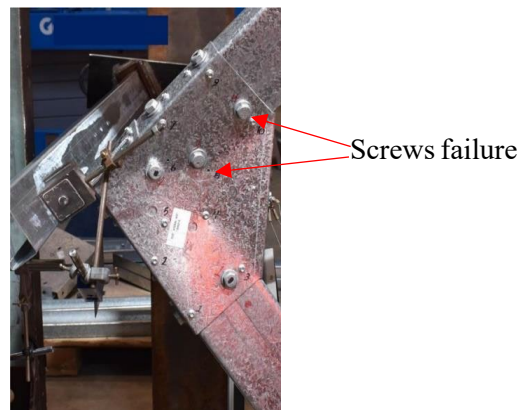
Details of test setup for eaves joint after Zhang et al. (2016a)
